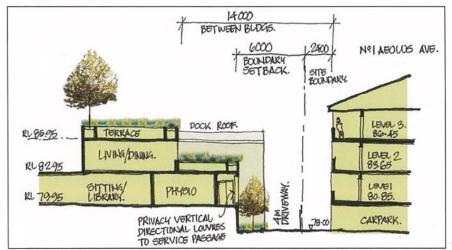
Section showing revised roof to loading dock and relationship with No.1 Aeolus Ave. Louvres to walkway also indicated. (source: Woodhead Architects)
